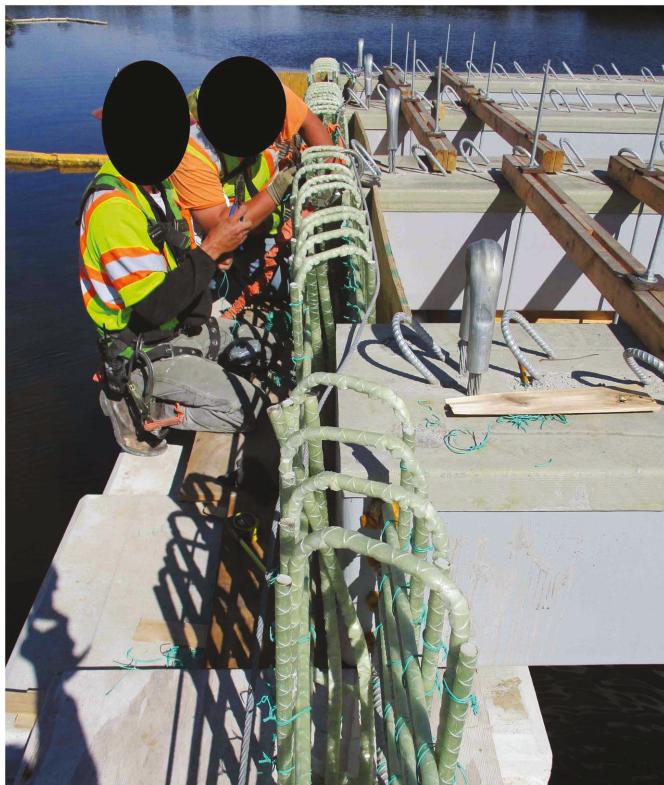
GFRP no. 6 stirrups placement in diaphragm sections. (Image by Thomas Cadenazzi.)
